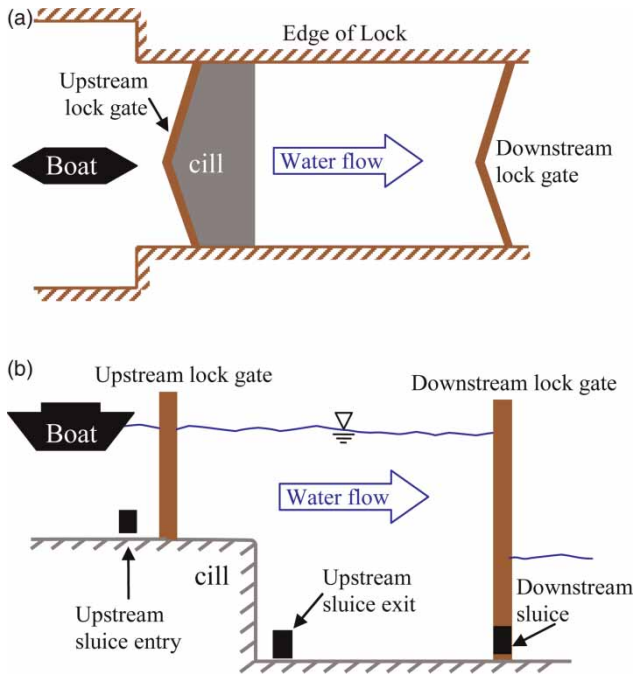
| Sketch of a lock. (a) Plan view, (b) elevation view.
